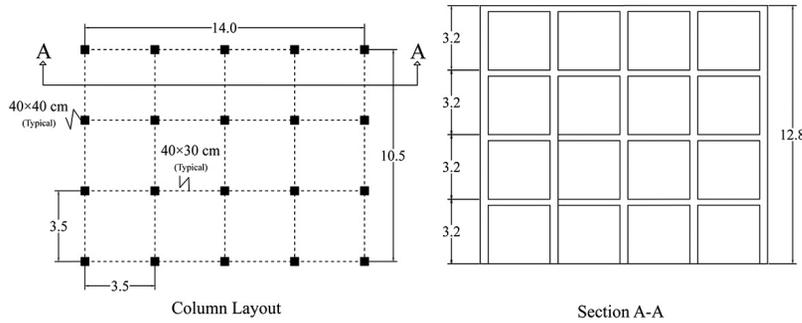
Column layout and elevation (unspecified dimensions are in meters)
